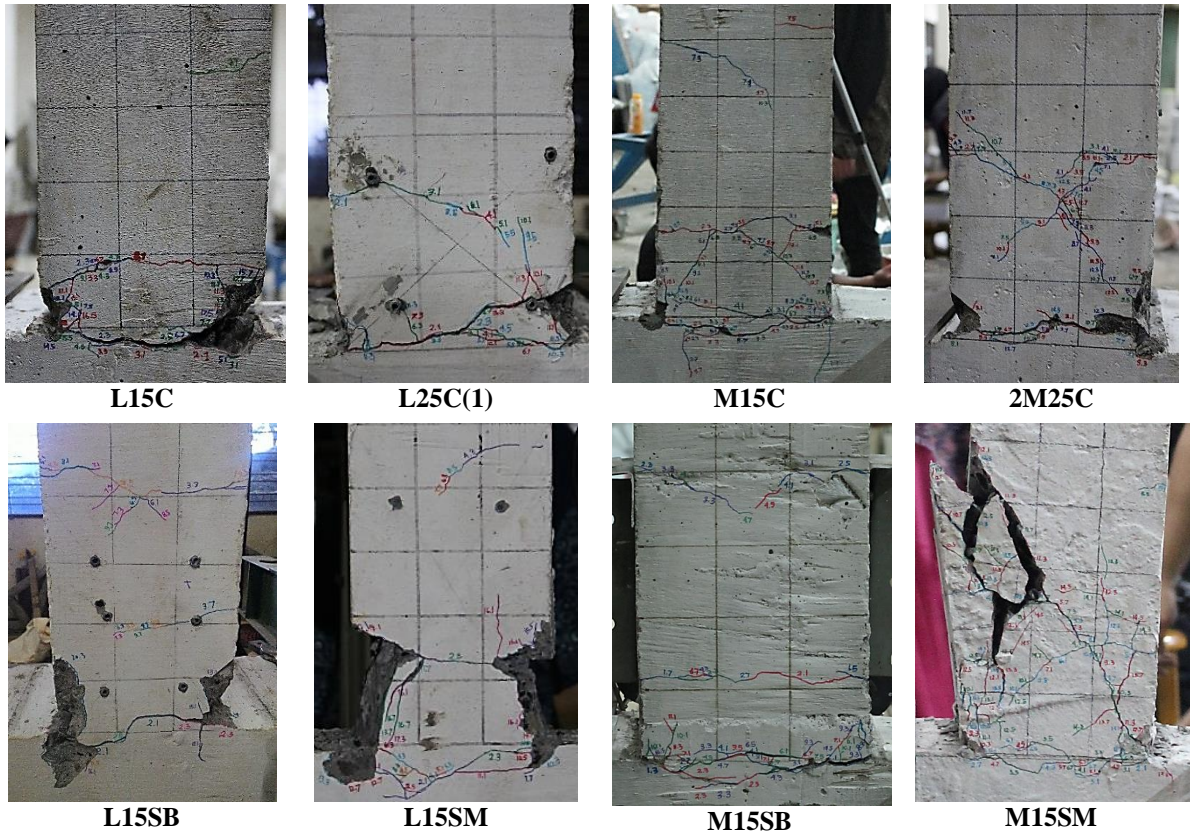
Crack Propagation and collapse mechanism of all column specimens.
